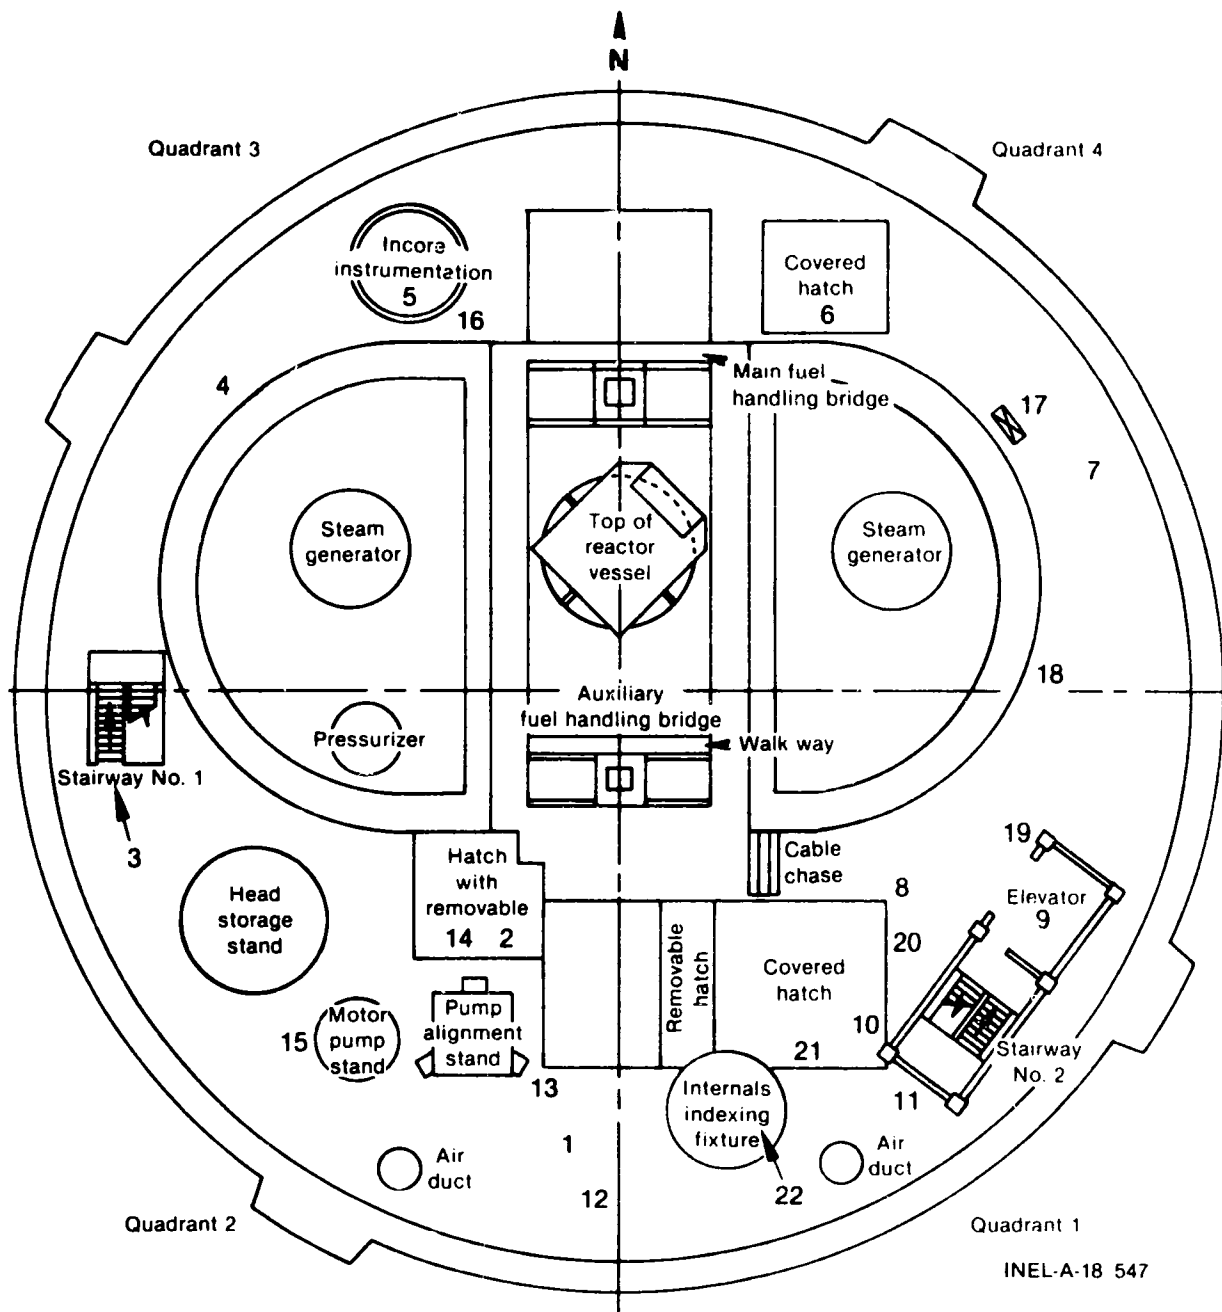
Elevation 347, Entry 3 radiation survey locations (see Table 3).
